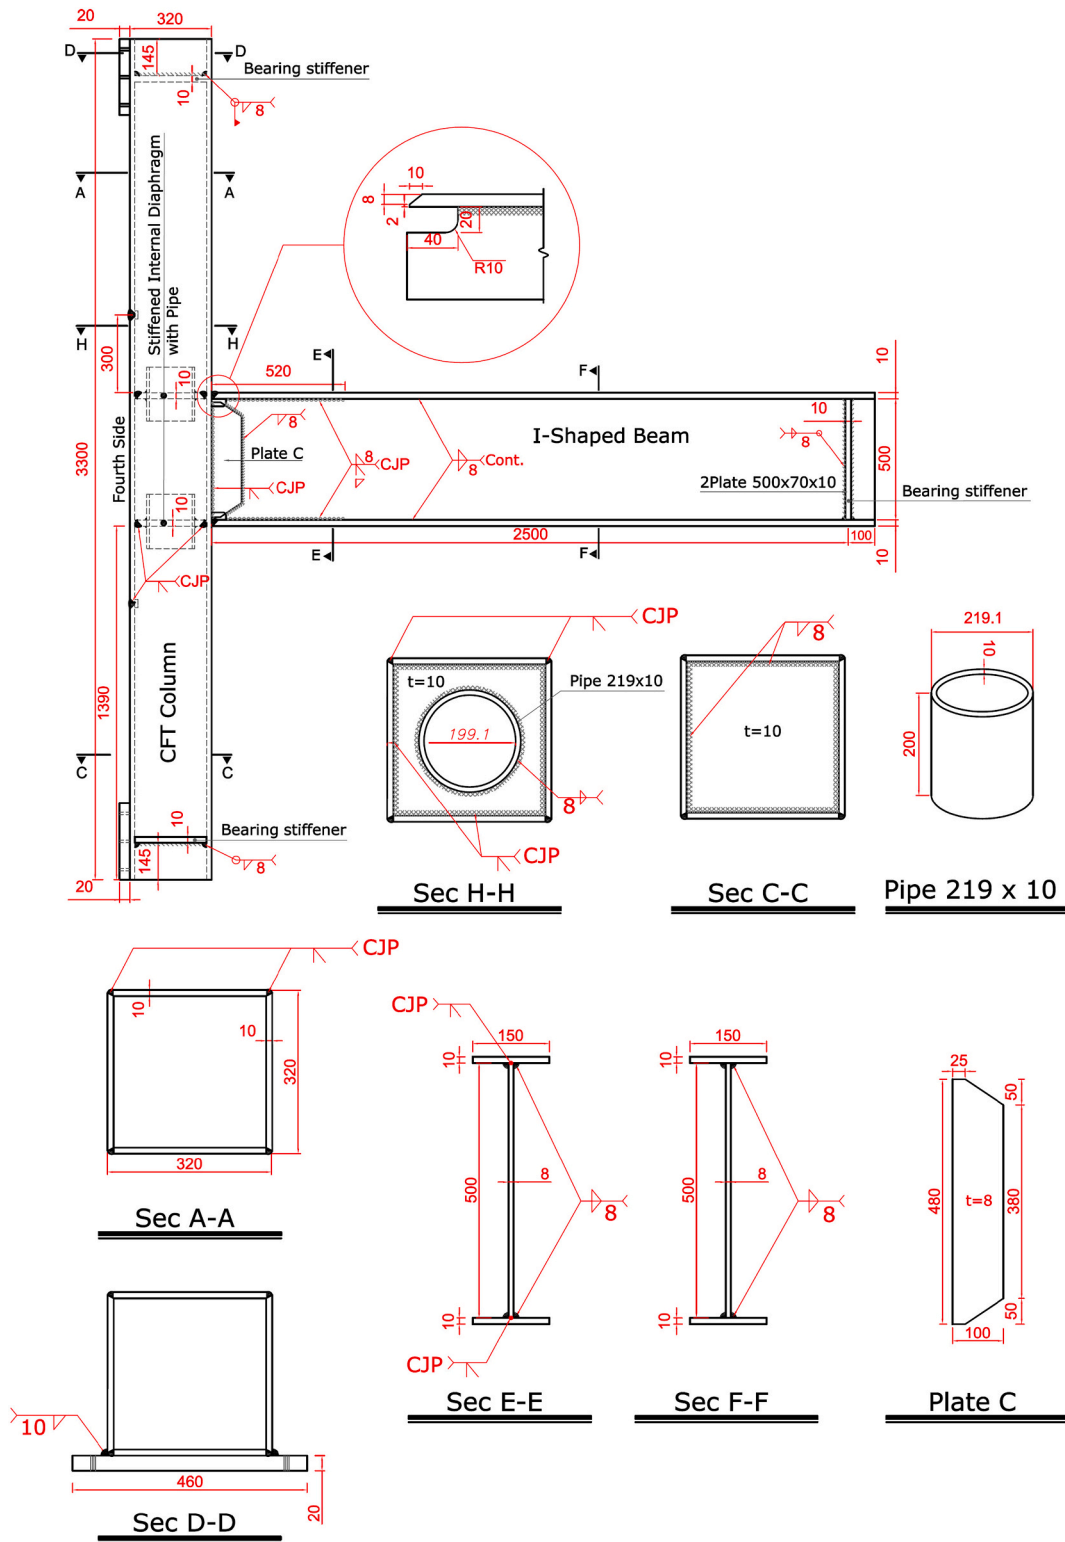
The detailed drawing of specimen 2 (SID). (Unit: mm).
